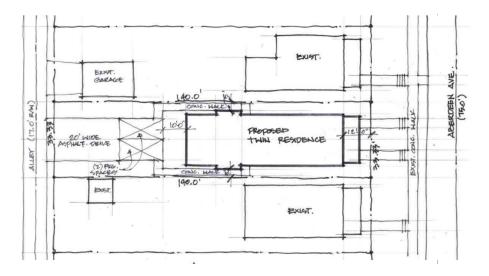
The site plan for the house at 1371 Aberdeen Ave. Image included in application packet.
